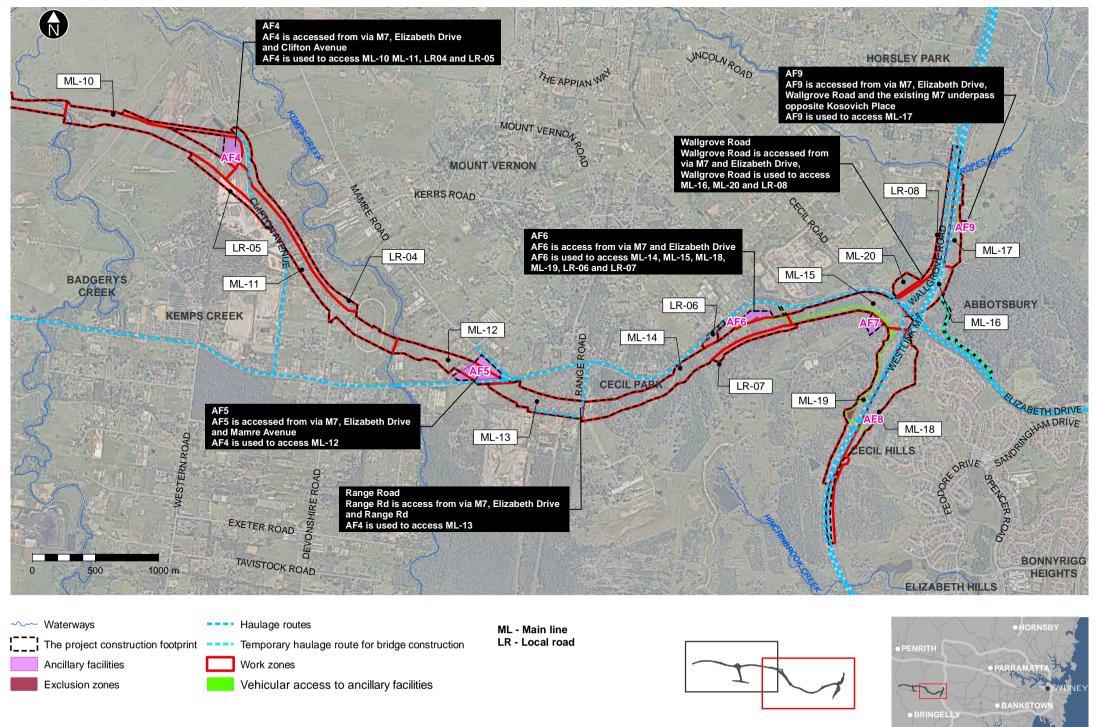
Proposed heavy vehicle haulage routes on public roads (eastern construction ancillary facilities)
